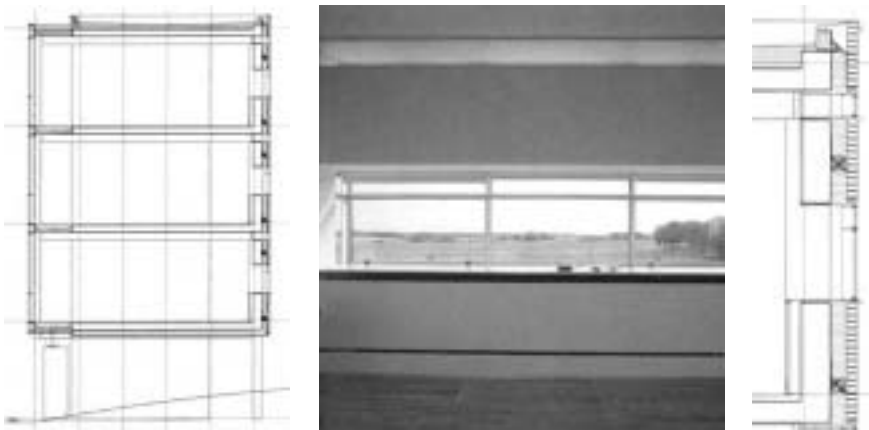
Section drawing of the three-storied southern office wing elevated from the ground on concrete pillars (*left*). The appearance of the south façade viewed from the inside with the characteristic skylight windows located right under the ceiling (*middle and right*).
